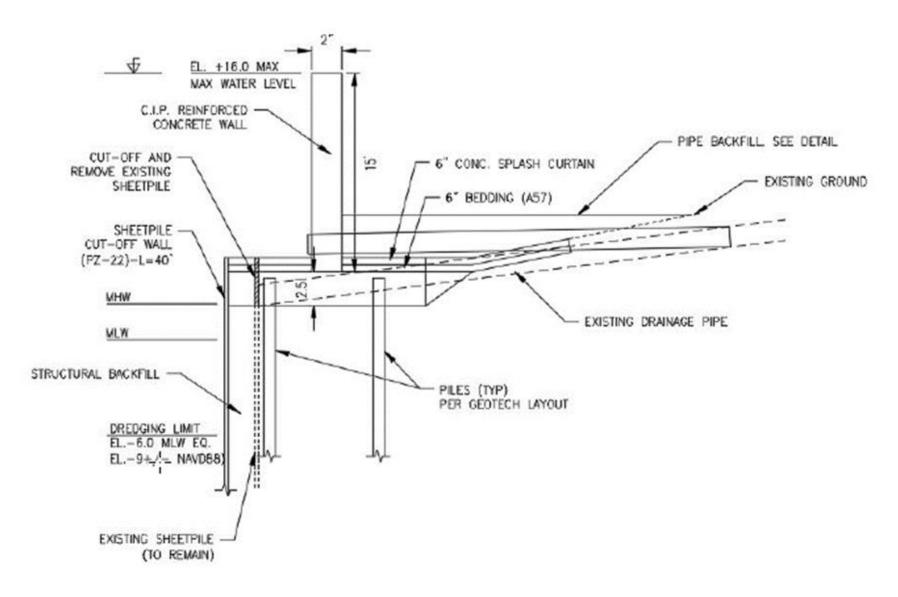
Typical Section Type C Cantilever Concrete Floodwall (Perimeter Plans)
